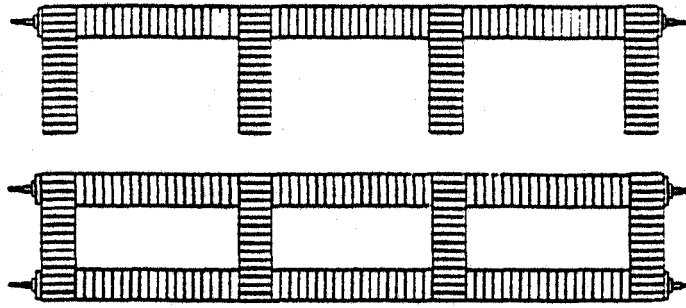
End view cross-sections of a stress-laminated T-beam bridge (top) and a stress-laminated box-beam bridge (bottom).
